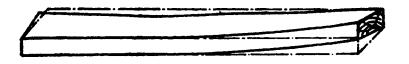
CLAMPED CENTRE-HEART SLEEPER
